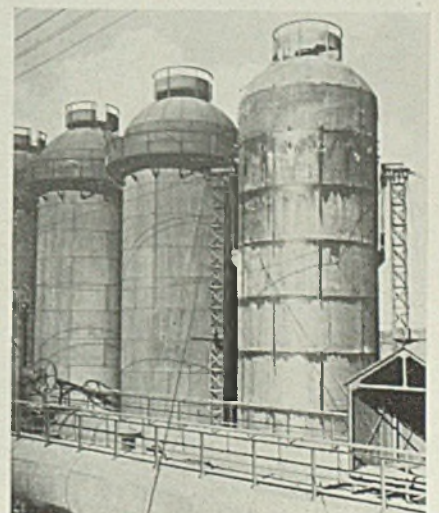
Top of welded shell showing dome construction and method of suspension from derricks
